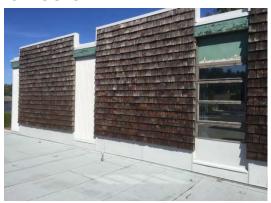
Photo B-Sections of roof where Block 2 and 3 abut have been re-flashed. No reports of problems with framing were identified in these locations.
